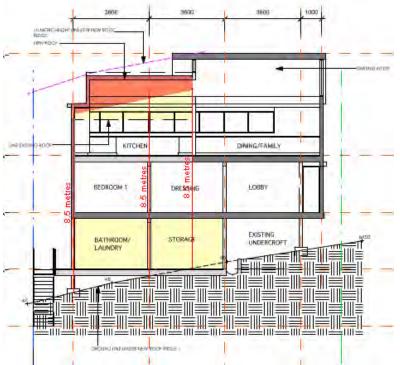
Section Plan demonstrating area of proposed works that exceeds the 8.5m height limit
